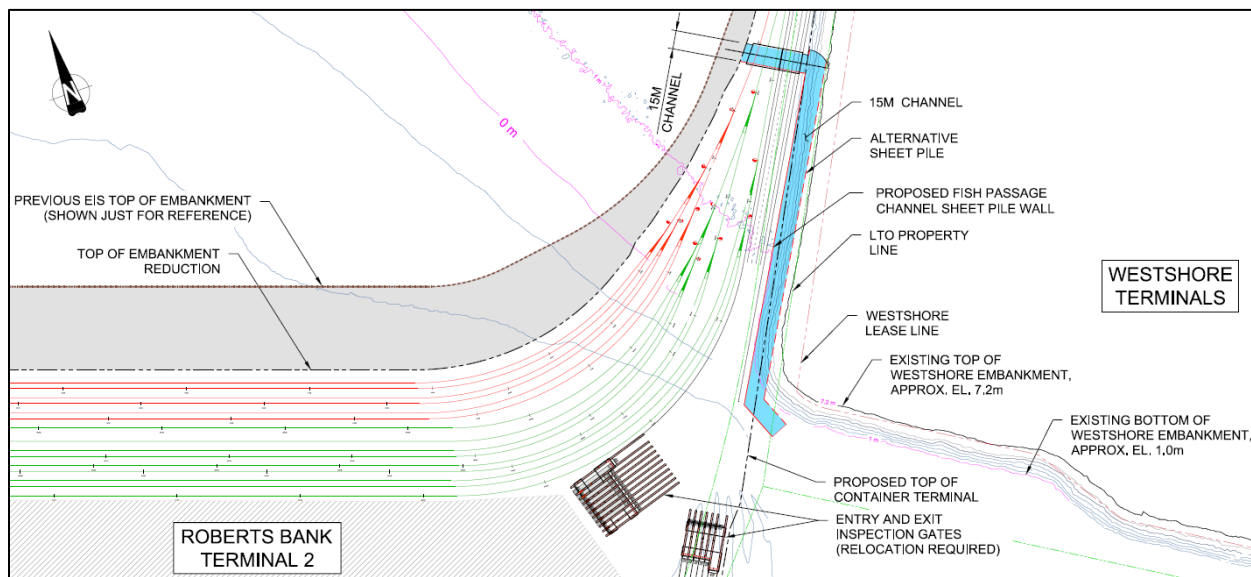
Marine Terminal Breach Conceptual Site Plan
